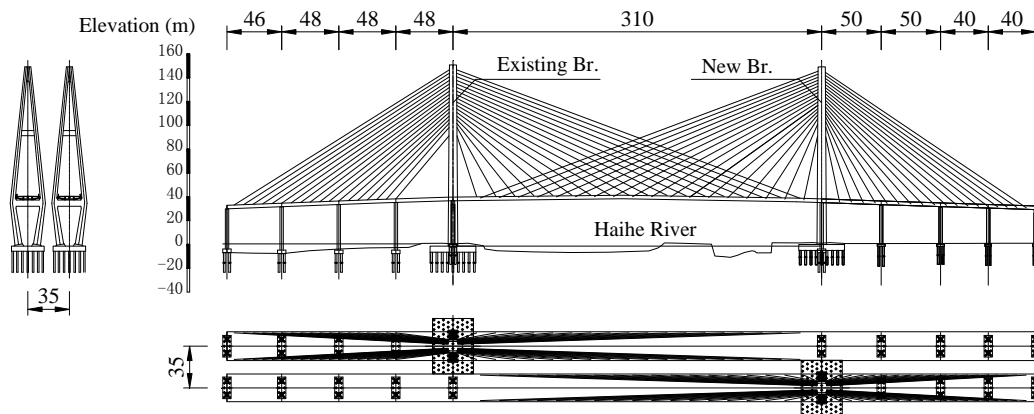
Layout of the existing and new Tanggu Haihe Bridge in Tianjin (Unit: m)
